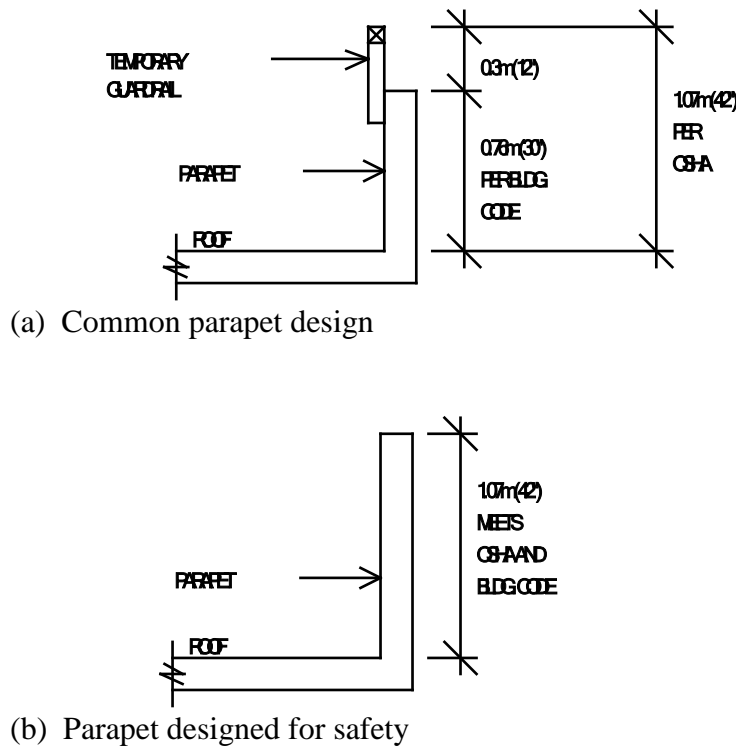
Parapet Design: Parapet meets (a) building code requirements, (b) OSHA and building code requirements
